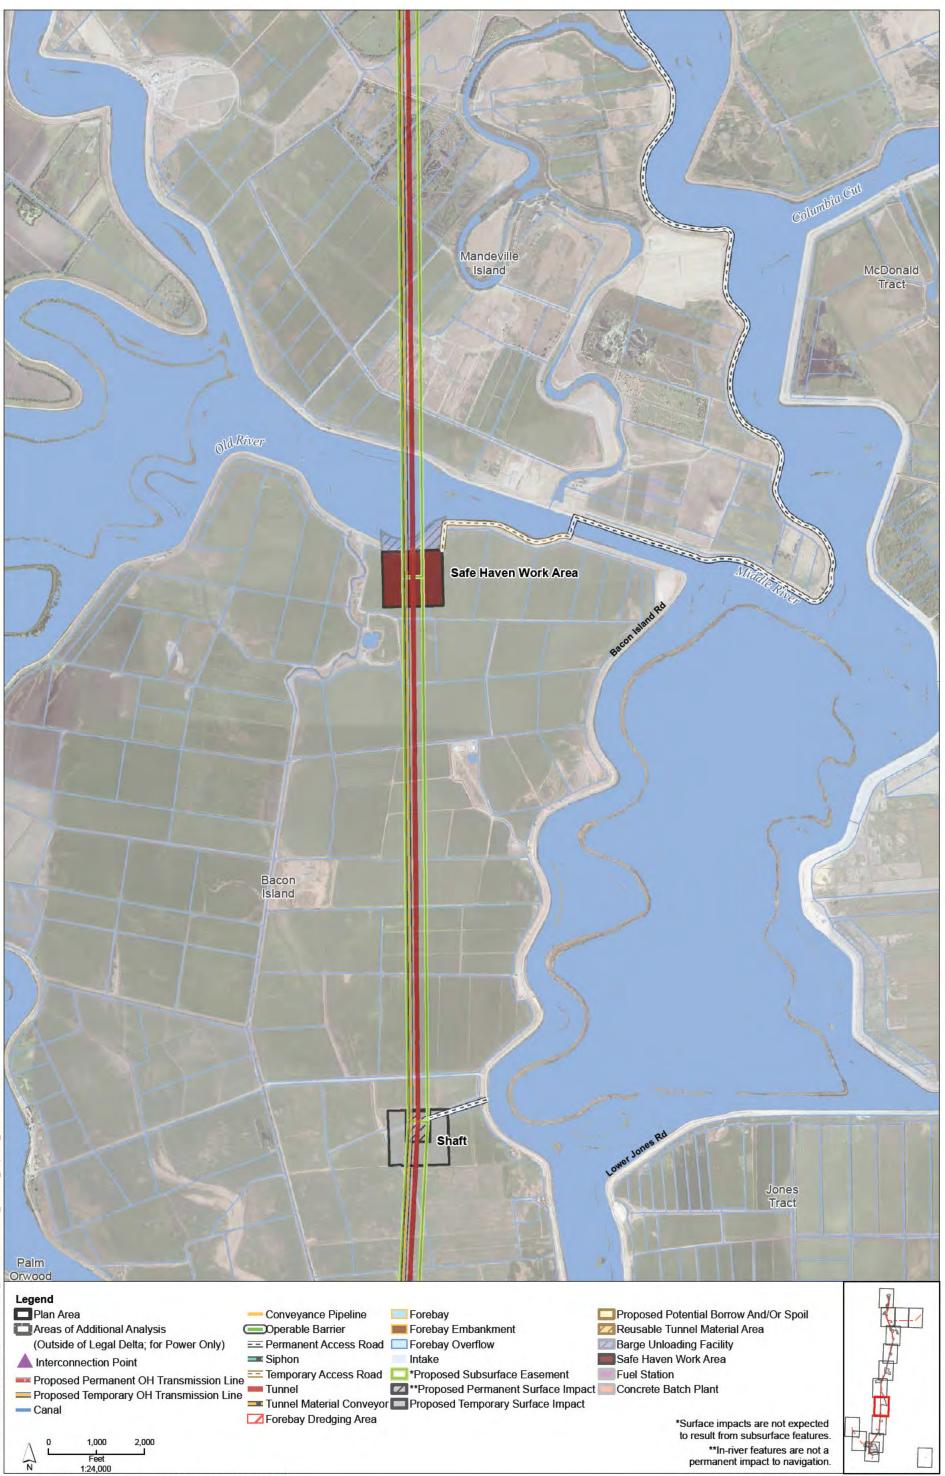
Sheet 6 of 15 Modified Pipeline/Tunnel Alignment (Alternative 4)
